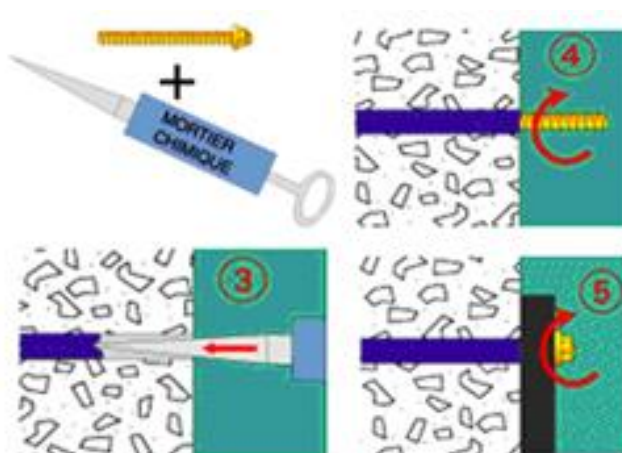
ANCHOR BOLT AND WELDING OR BOLTING STRAPS
